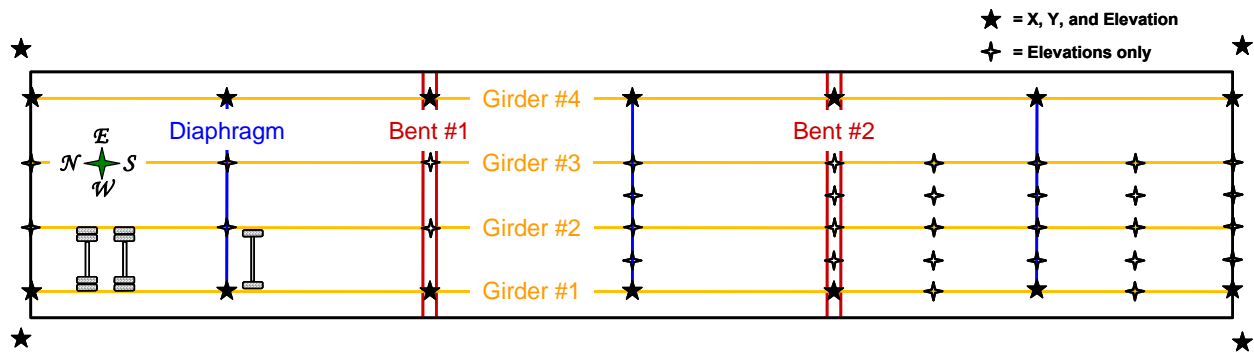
Survey Points Shown on Plan View of Bridge Deck
